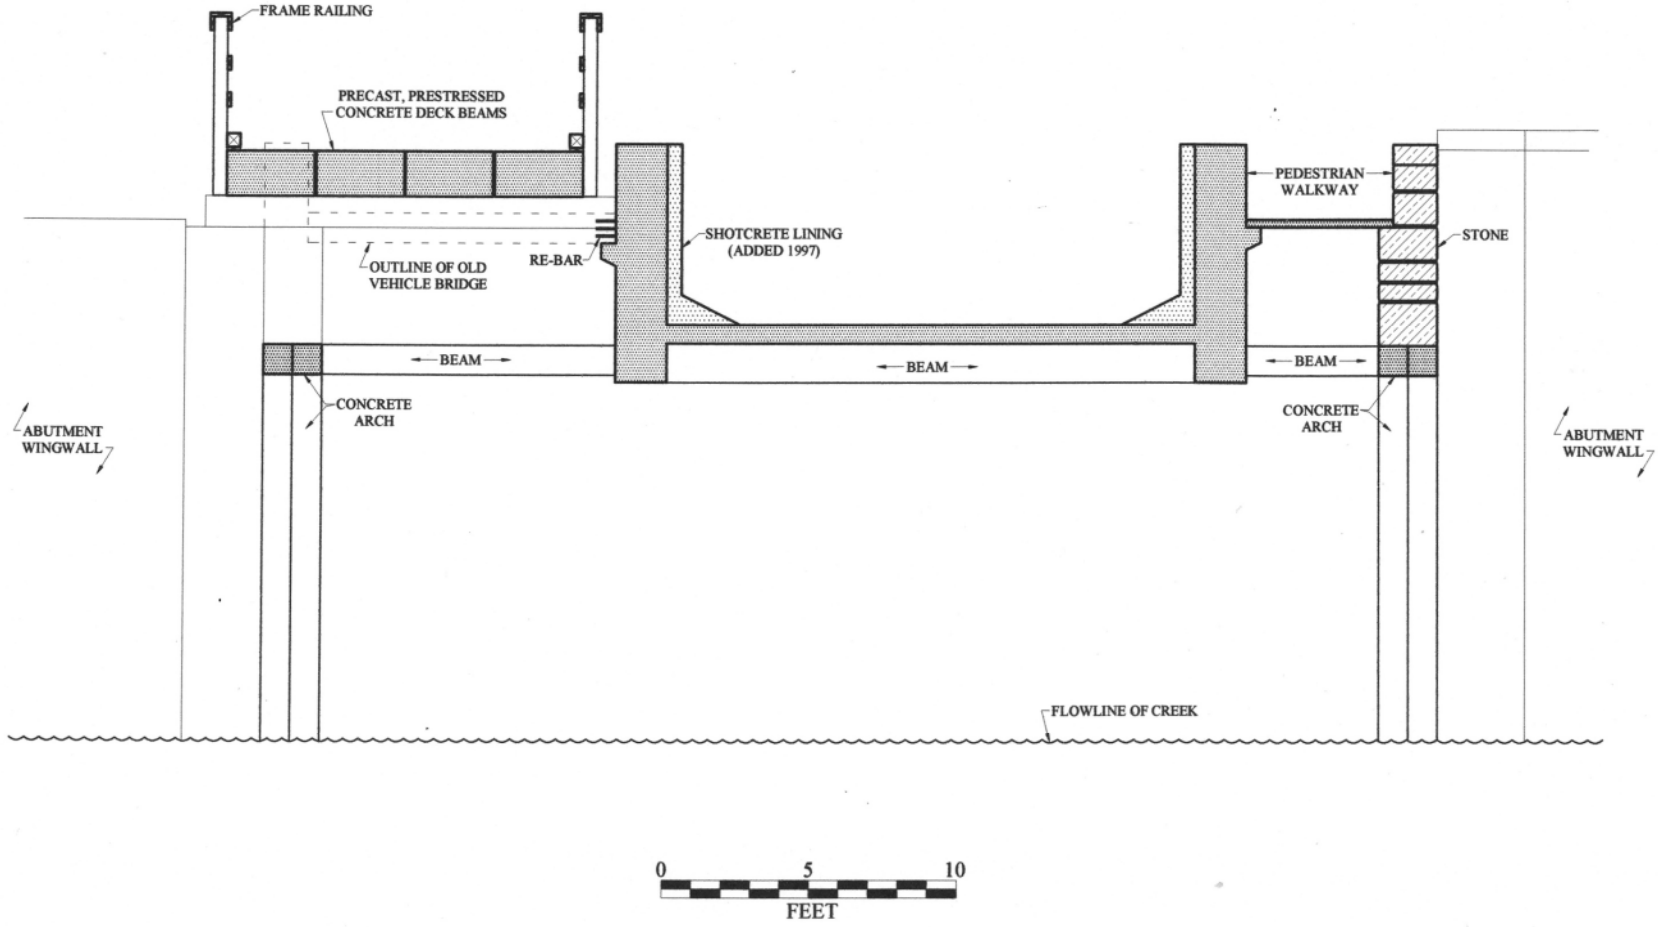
Sectional through the Nettle Creek Aqueduct, looking west. The abutment wingwalls are not shown in their entirety.
